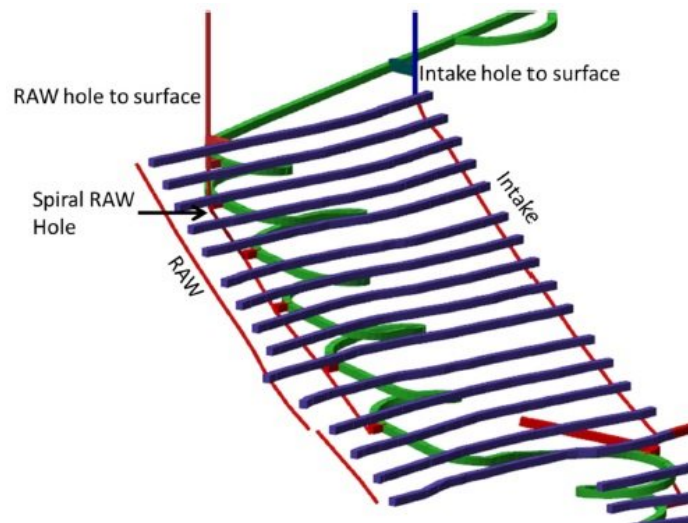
Example of Ventilation System for SLOS Method (Long and Transverse) (not to scale)
